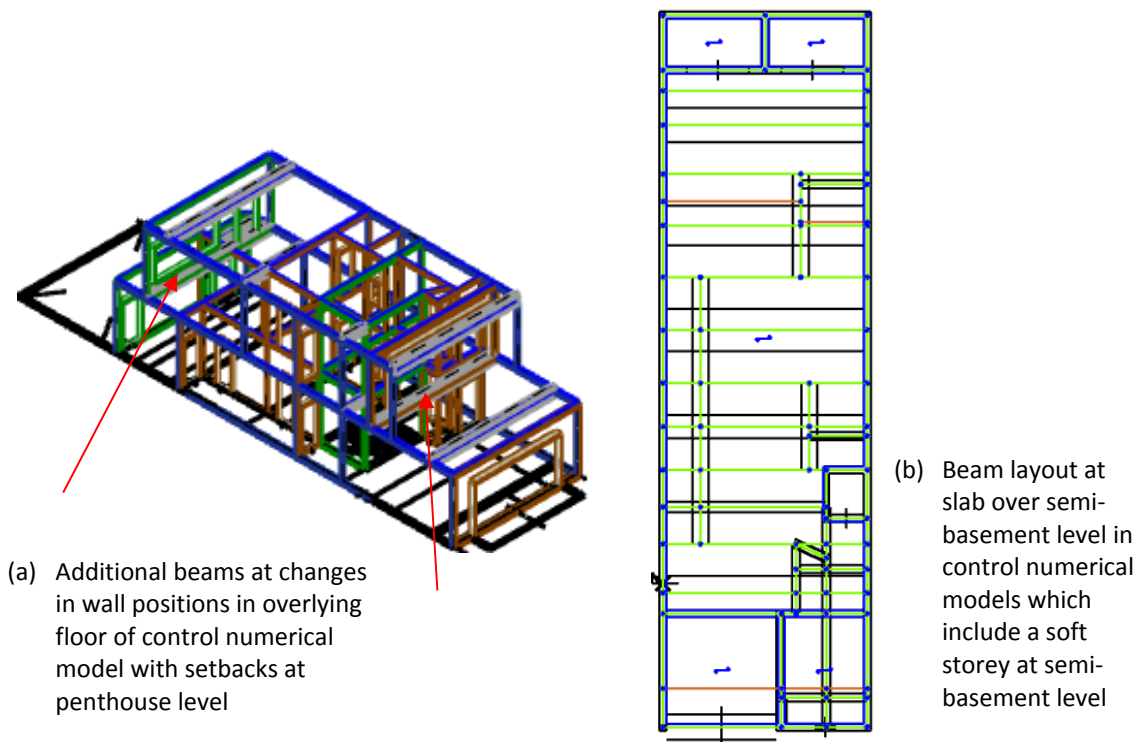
Additional beams inserted in apartment levels at changes in wall positions and at slab over semi-basement level in control numerical models, which include a soft storey at the lowest level.
